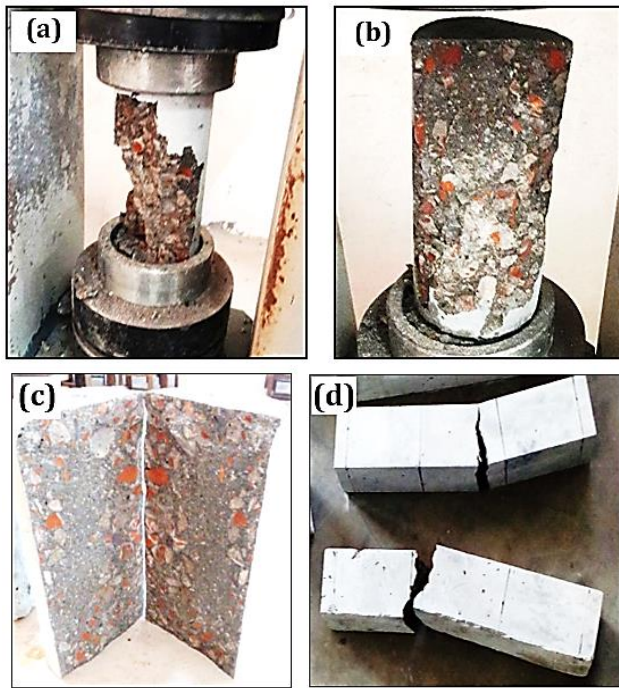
Failure pattern of the concrete cylinder under (a & b) compressive strength test (c) splitting tensile strength test (d) beam flexural strength test
